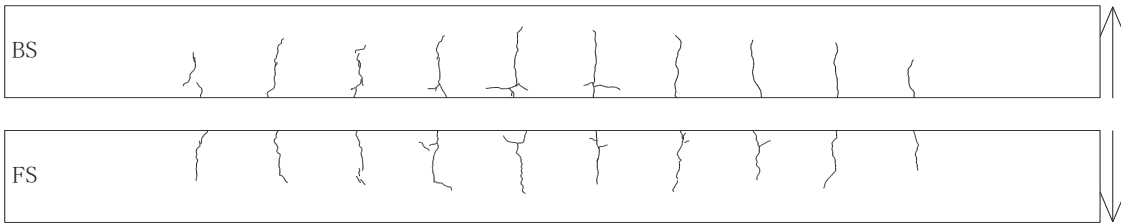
Cracking situation on C4 beam at 28 days
